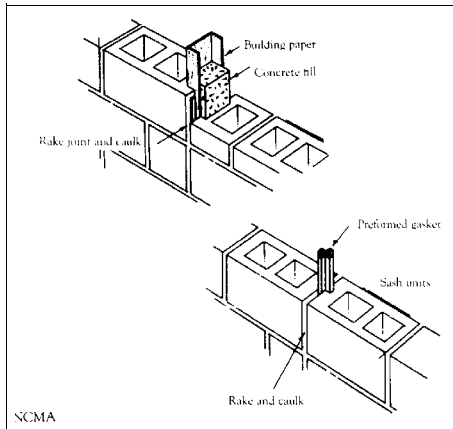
Control joints, such as the Michigan joint shown at left, reduce cracking by accommodating movement in the wall. Yet the joint transfers enough shear and flexural strength to keep the wall from being pushed in by earth pressures. Another version, shown at left below, uses a pre-formed star-shaped gasket.
